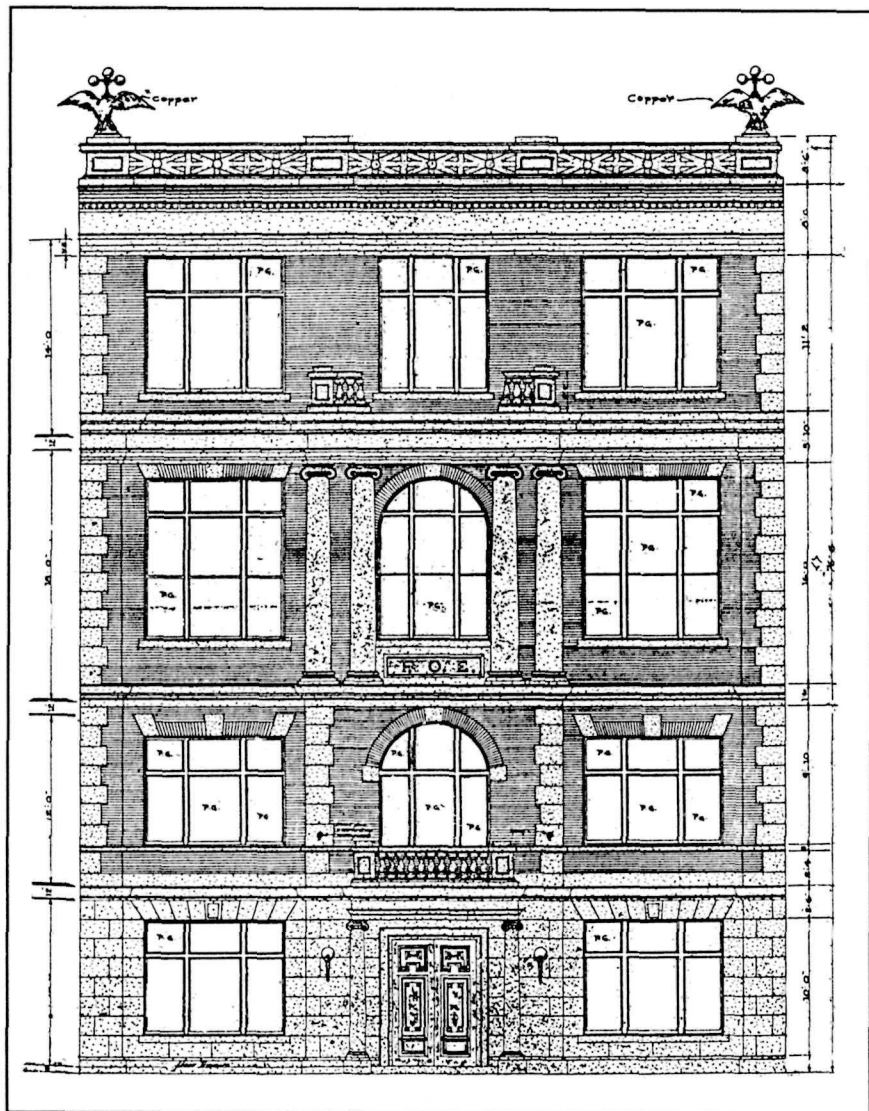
Eagles Building. Drawing of 12th Avenue facade, March 9, 1912.
